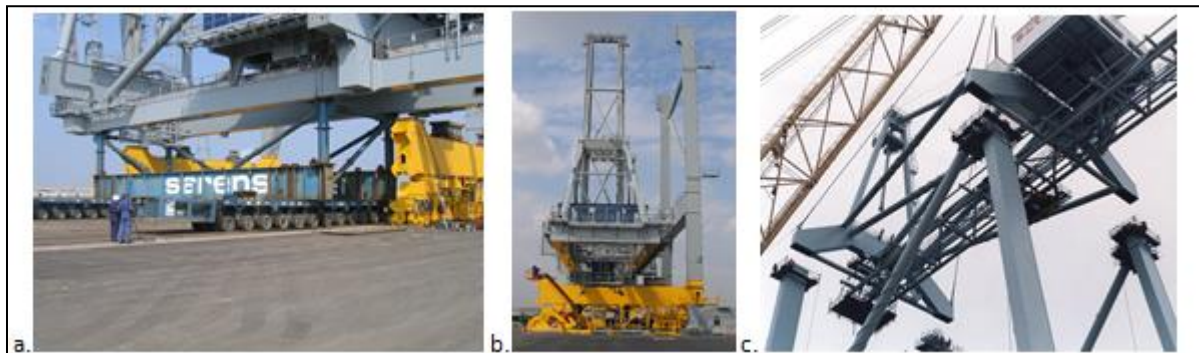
a) Placement of the upper structure on top of the sill beams b) semi-erected crane, whereby the side portal starboard is placed c) Placement of the upper structure onto the portal frame
